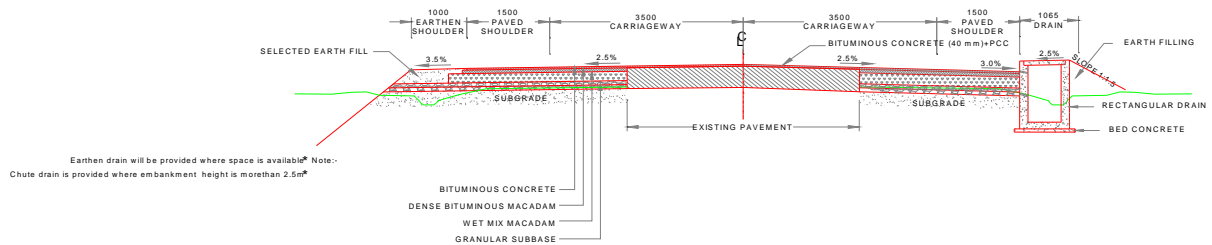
TYPICAL CROSS SECTION- TYPE-7
